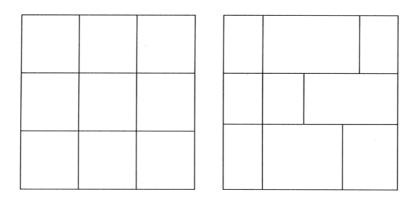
Variation of schematic floor plan to show that surface area of interior walls is independent of arrangement.
